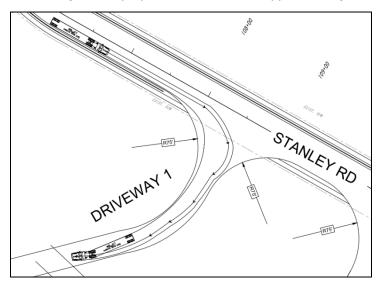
Stanley Road at Driveway 1 - Eastbound Right (Entering Truck)
